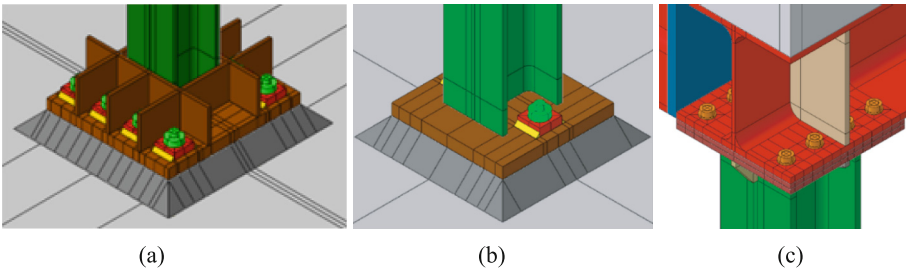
Details of modelling of connections: (a) stiffened column-base connection; (b) unstiffened column-base connection; (c) beam-to-column connection.
